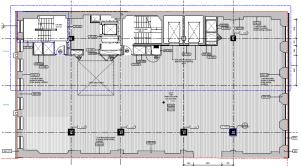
Beneficial House—Floor Plan, Level 1—showing proposed new stair and lift. (Source: Make + Architectus, A-285-12-01-0, 17 April 2019, similar to DA 2005 set issued 14 February 2017)
